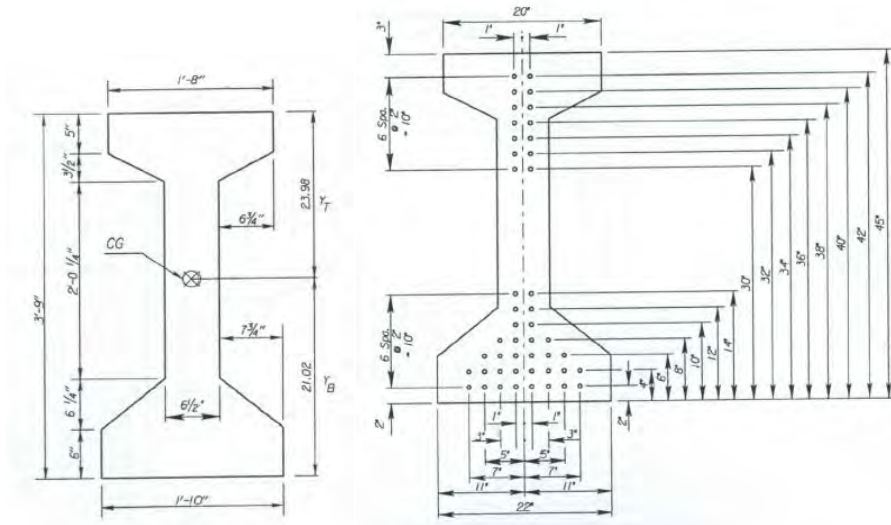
K-3 girder geometry and strand layout (KDOT 2016)
